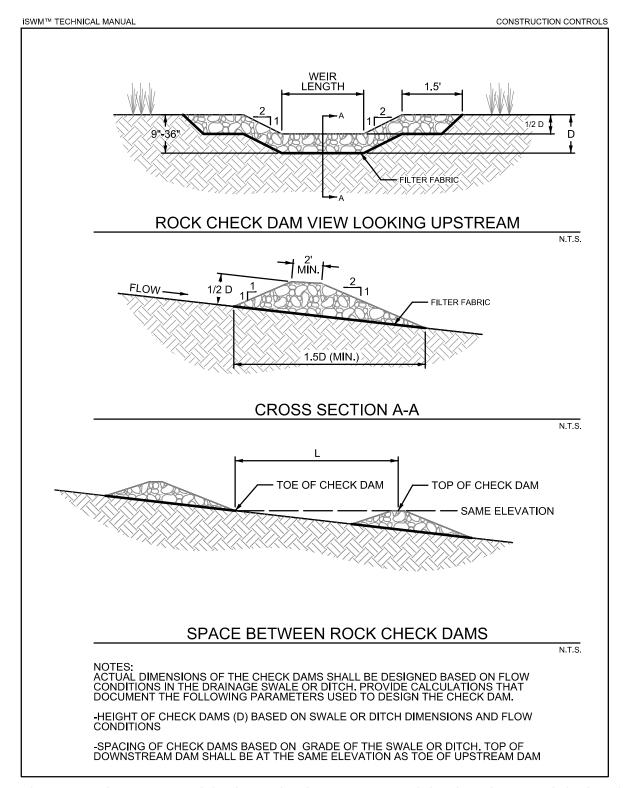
STANDARD CONSTRUCTION DETAIL - ROCK CHECK DAMS (1 OF 2)
